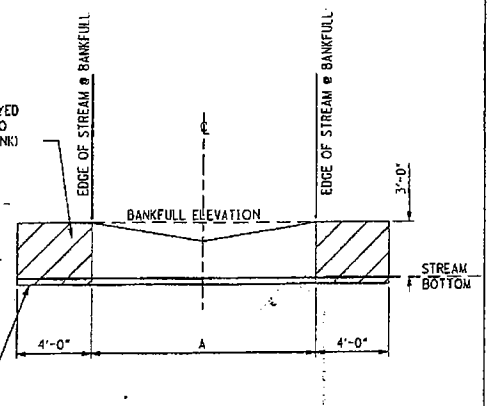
DETAILED ILLUSTRATION OF RIFFLE CROSS SECTION
